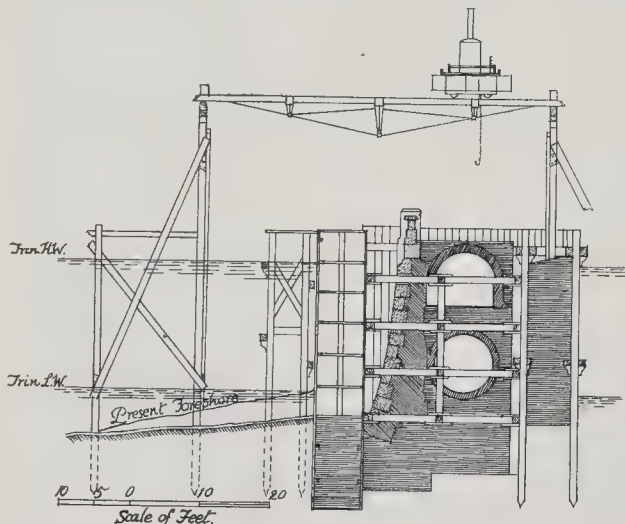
Section of Cofferdam used in Laying Foundation-stone, Retaining Wall, Sewer, and Subway of Thames Embankment, and Caissons forming the Front of the General Cofferdam Construction in the first Contract. (From the "*Builder*" of August 6, 1864.)
